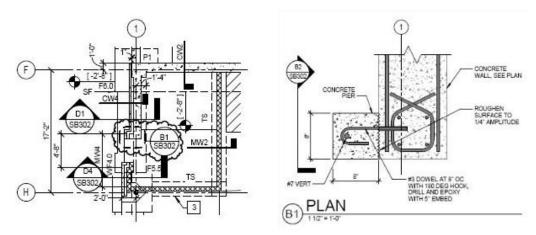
Constructability Issue - "the Material of Wall Pier Needs to Be Changed to Concrete"
